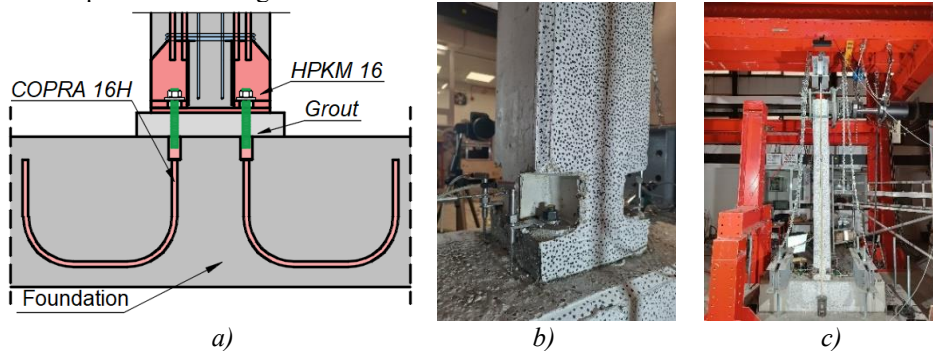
Connection detailing and experimental setup: (a) schematic design of the demountable column-to-foundation connection; (b) assembled connection; (c) test setup.
